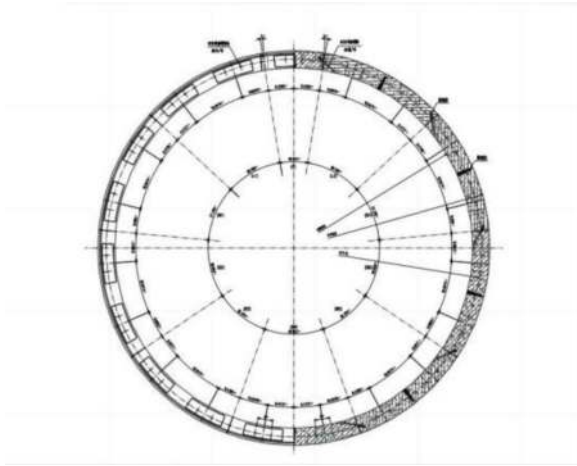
Cross-sectional structure of Caobao Road Tunnel.
